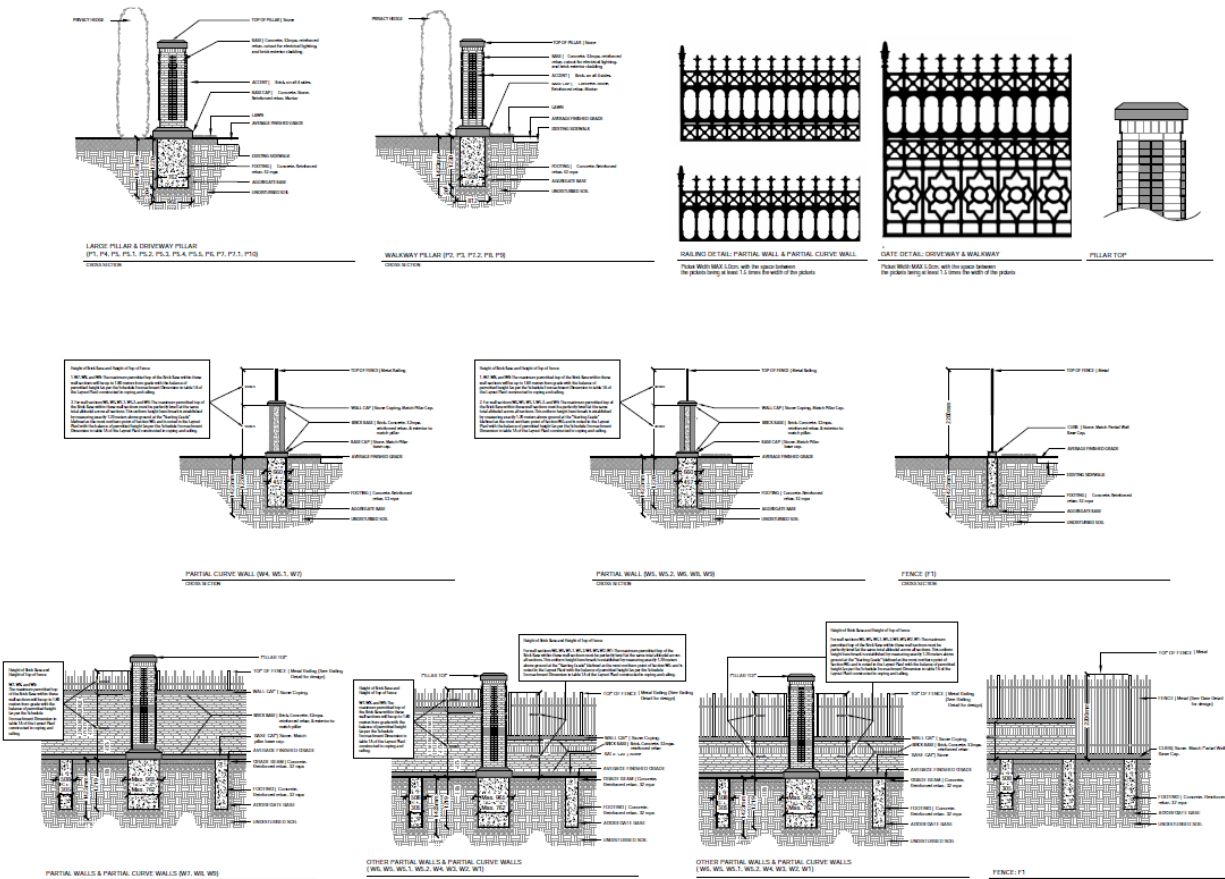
Proposed landscape details, elevations and cross sections (bsq Landscape Architects, 2026).
